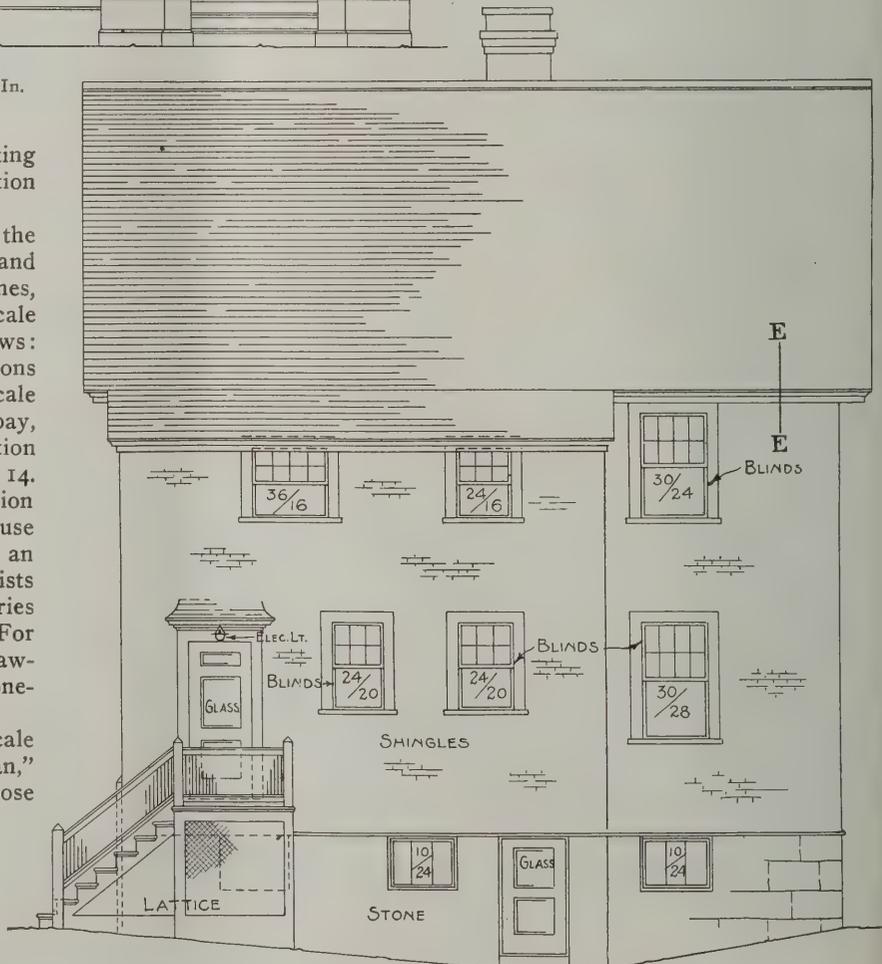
Rear Elevation—Scale $\frac{1}{8}$ -In. to the Foot
